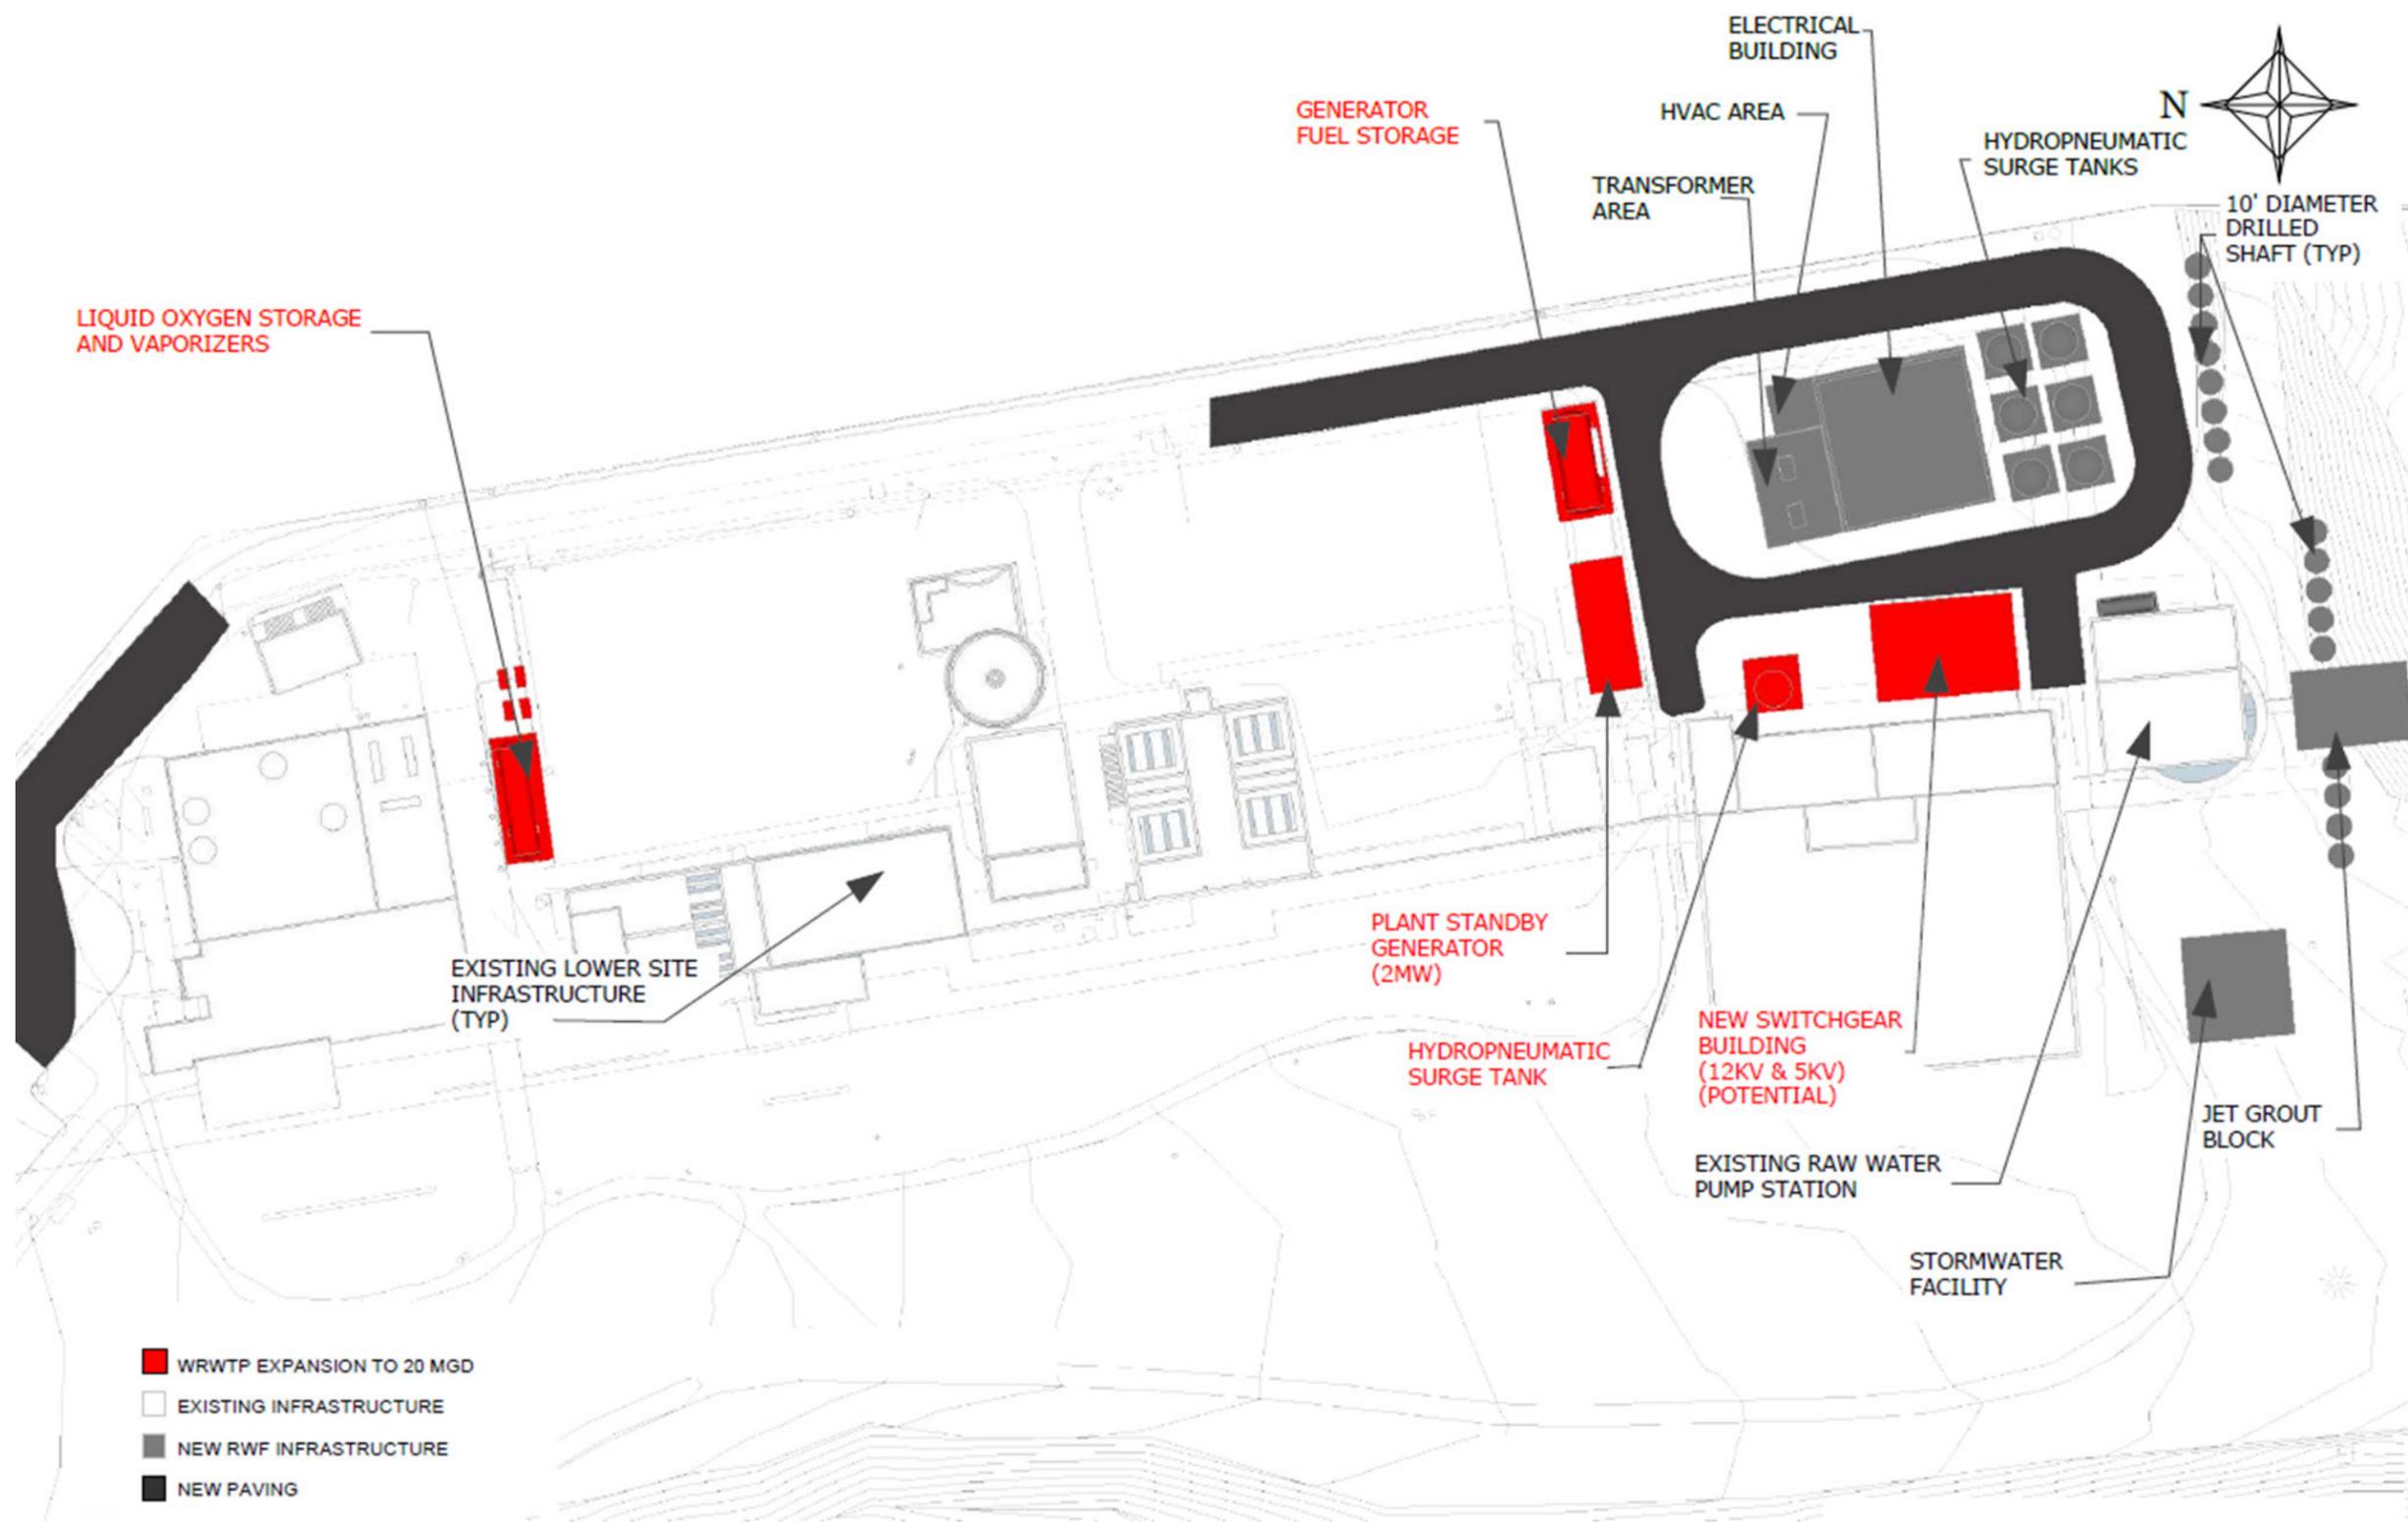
Site Plan – 20-MGD Capacity Expansion
